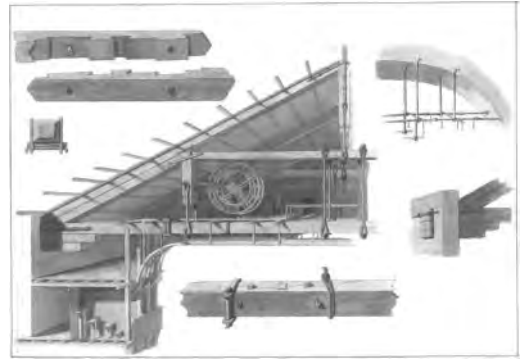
Construction and details of the roof truss of the Teatro Argentina in Rome by David Vogel (ZBZ, FA Escher v G 188.6, fol. 45).
